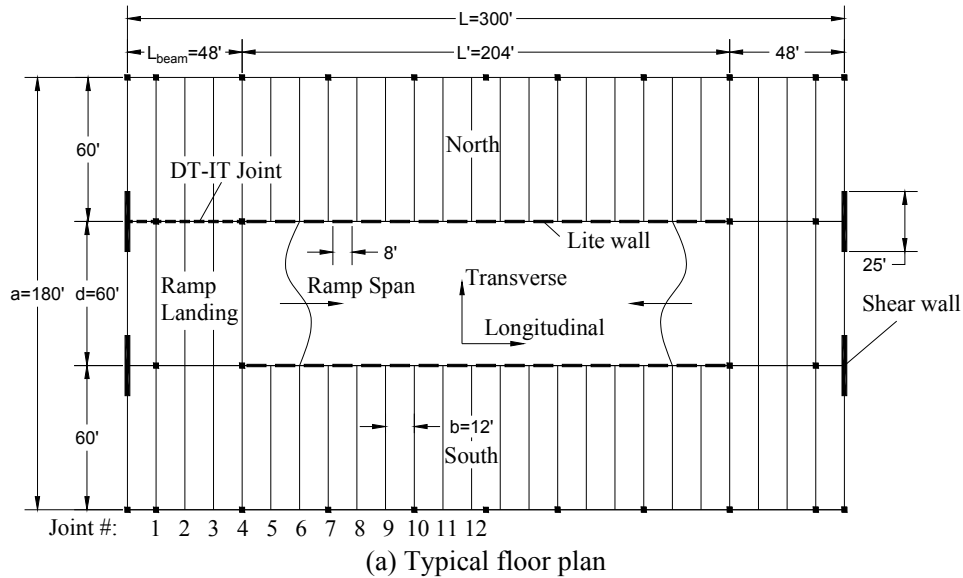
Example 1 Structure: 4-story perimeter wall parking garage.
